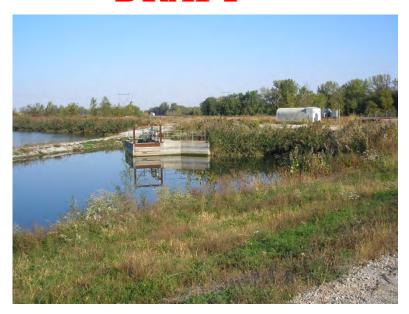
Main Ash Pond Primary Spillway Riser Structure
